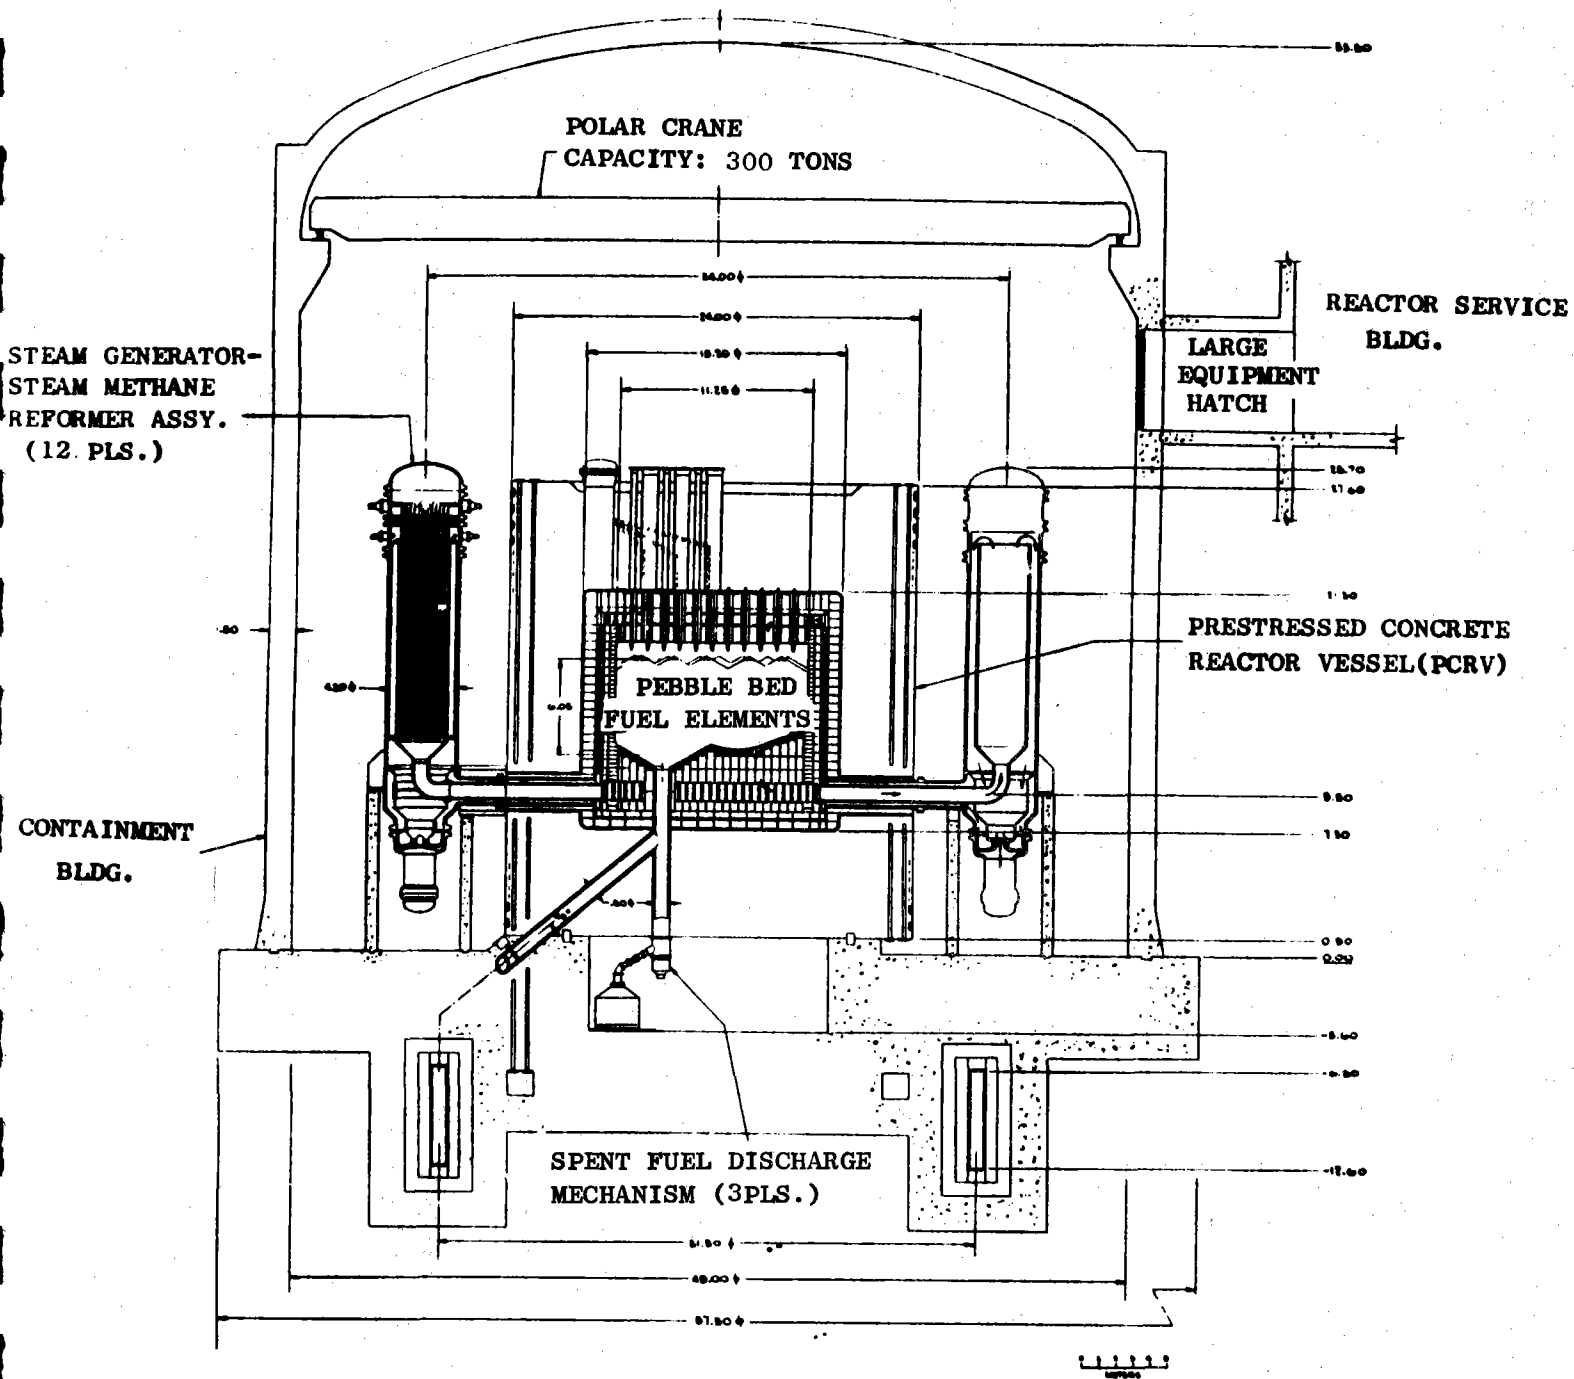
Details of Pebble Bed Reactor and the Reformer-Steam Generator Assembly.
